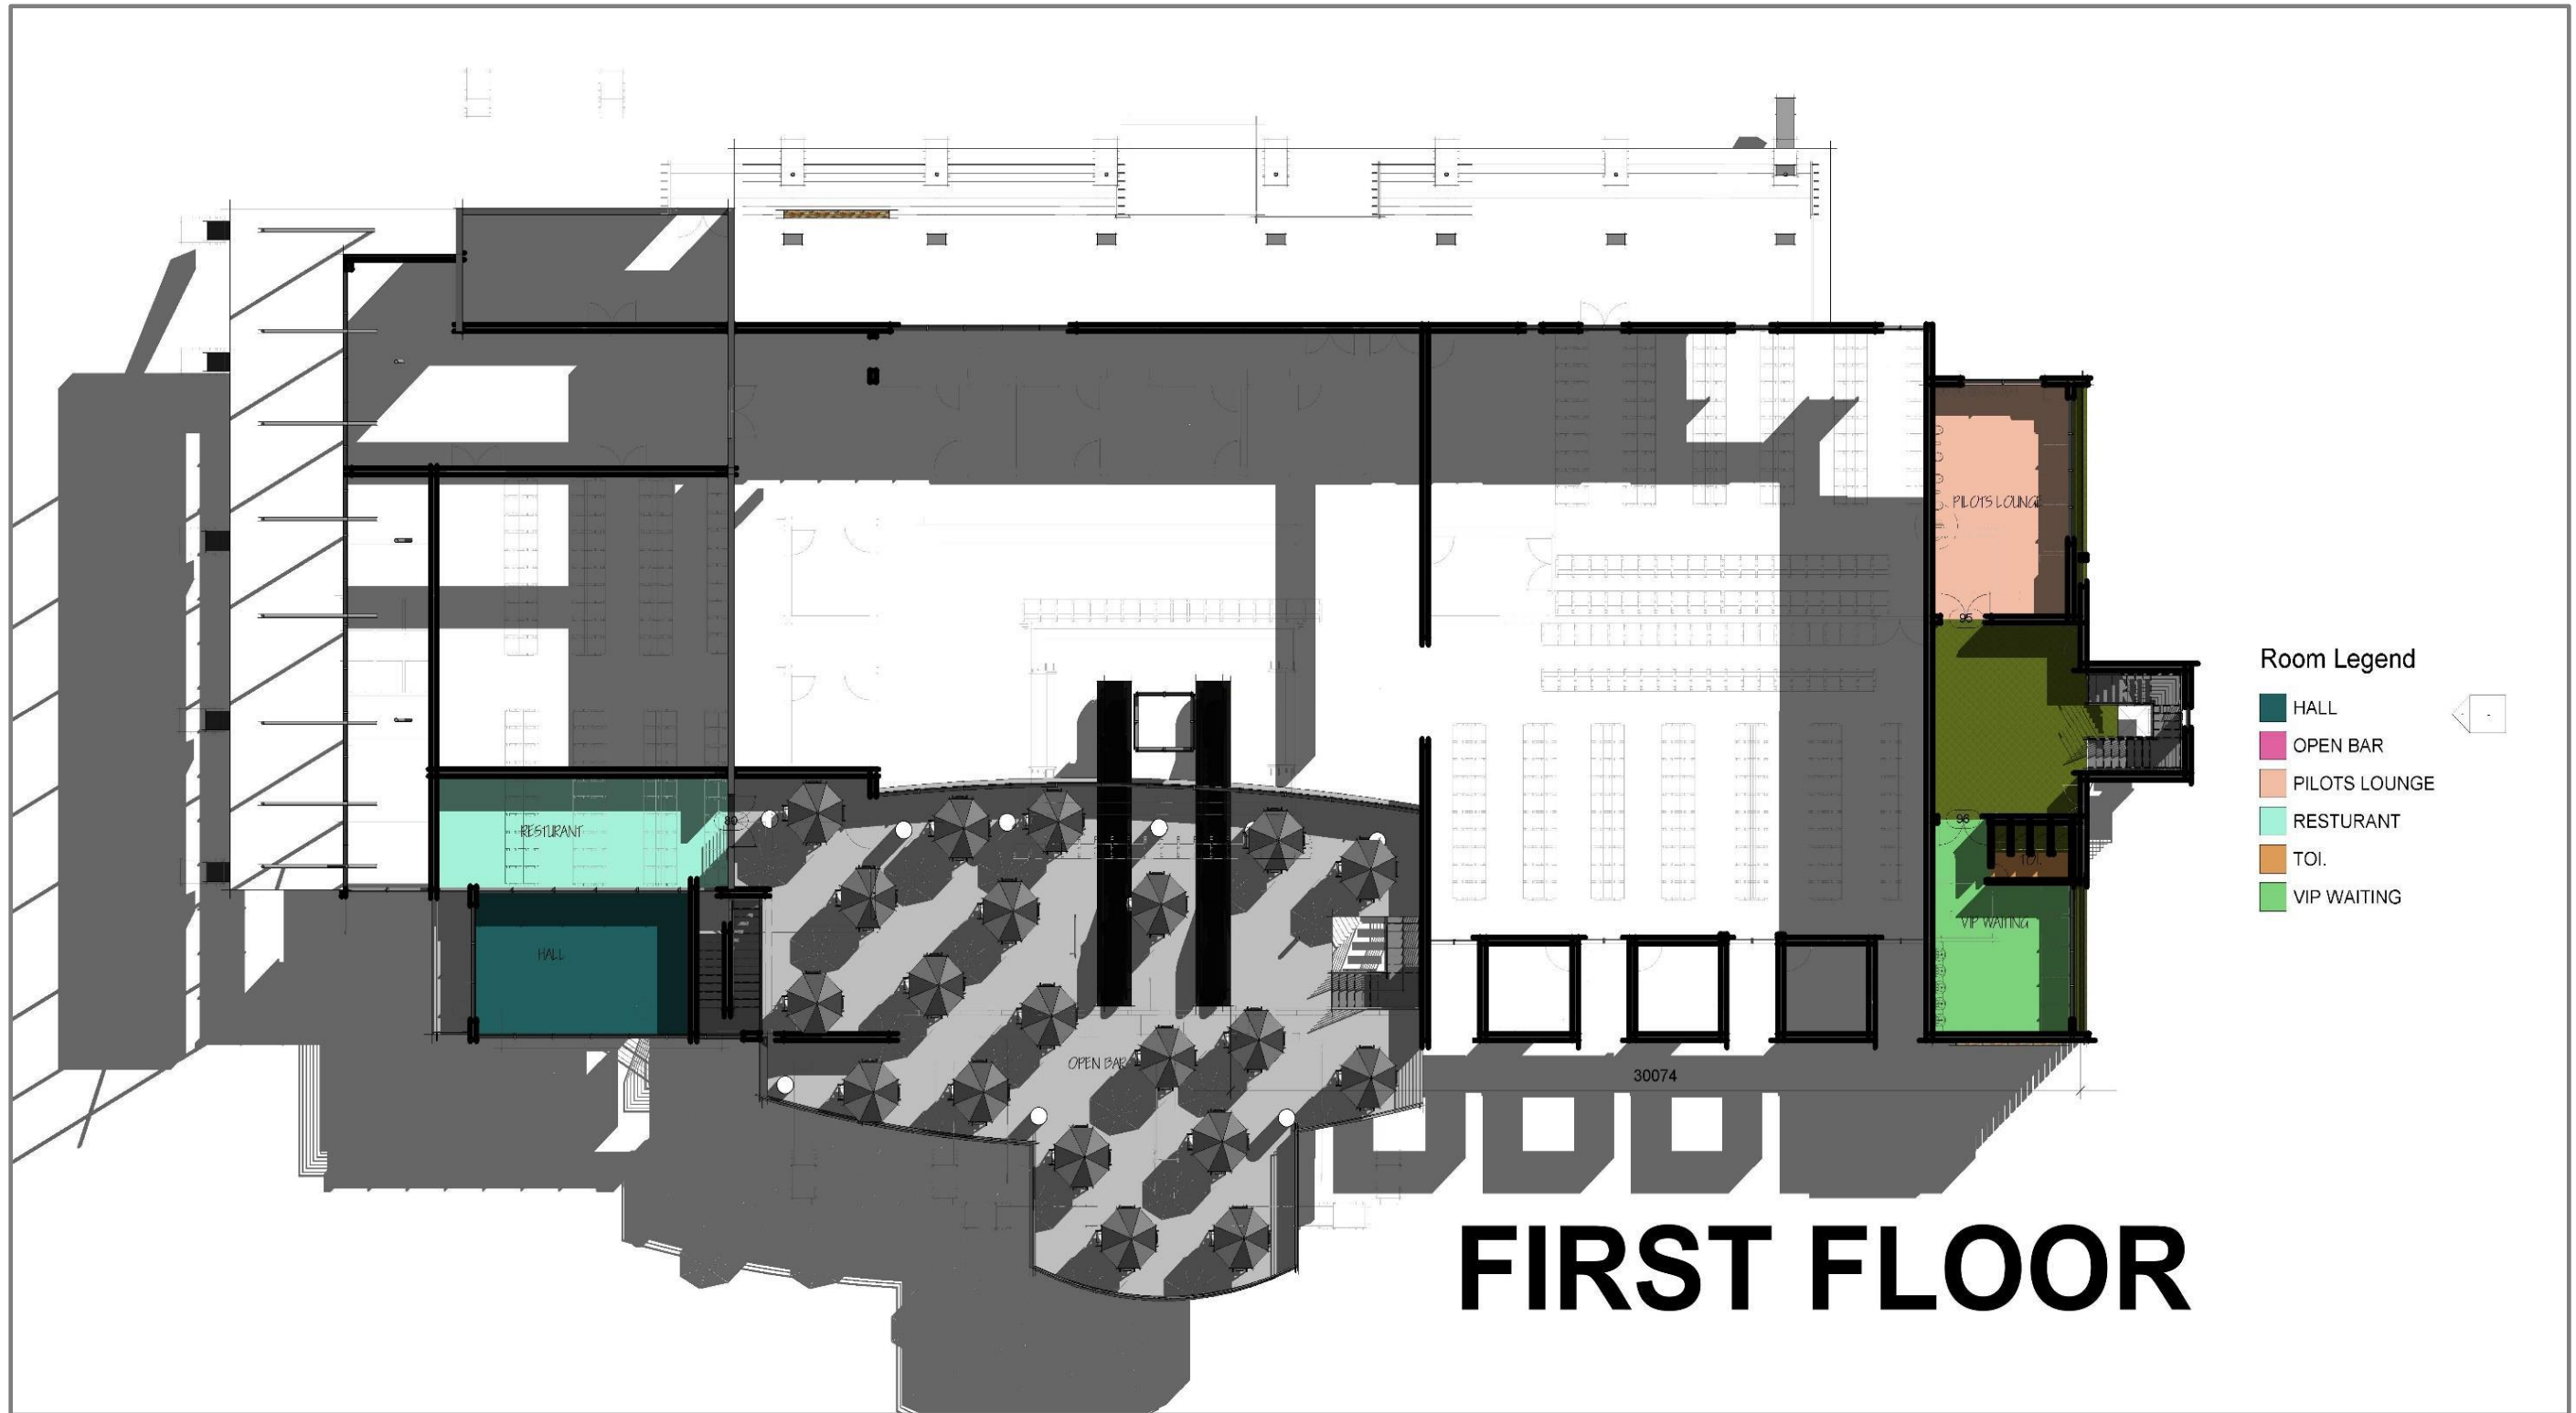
First floor of the Proposed Obudu Cargo and Passengers Airport Terminal Building
